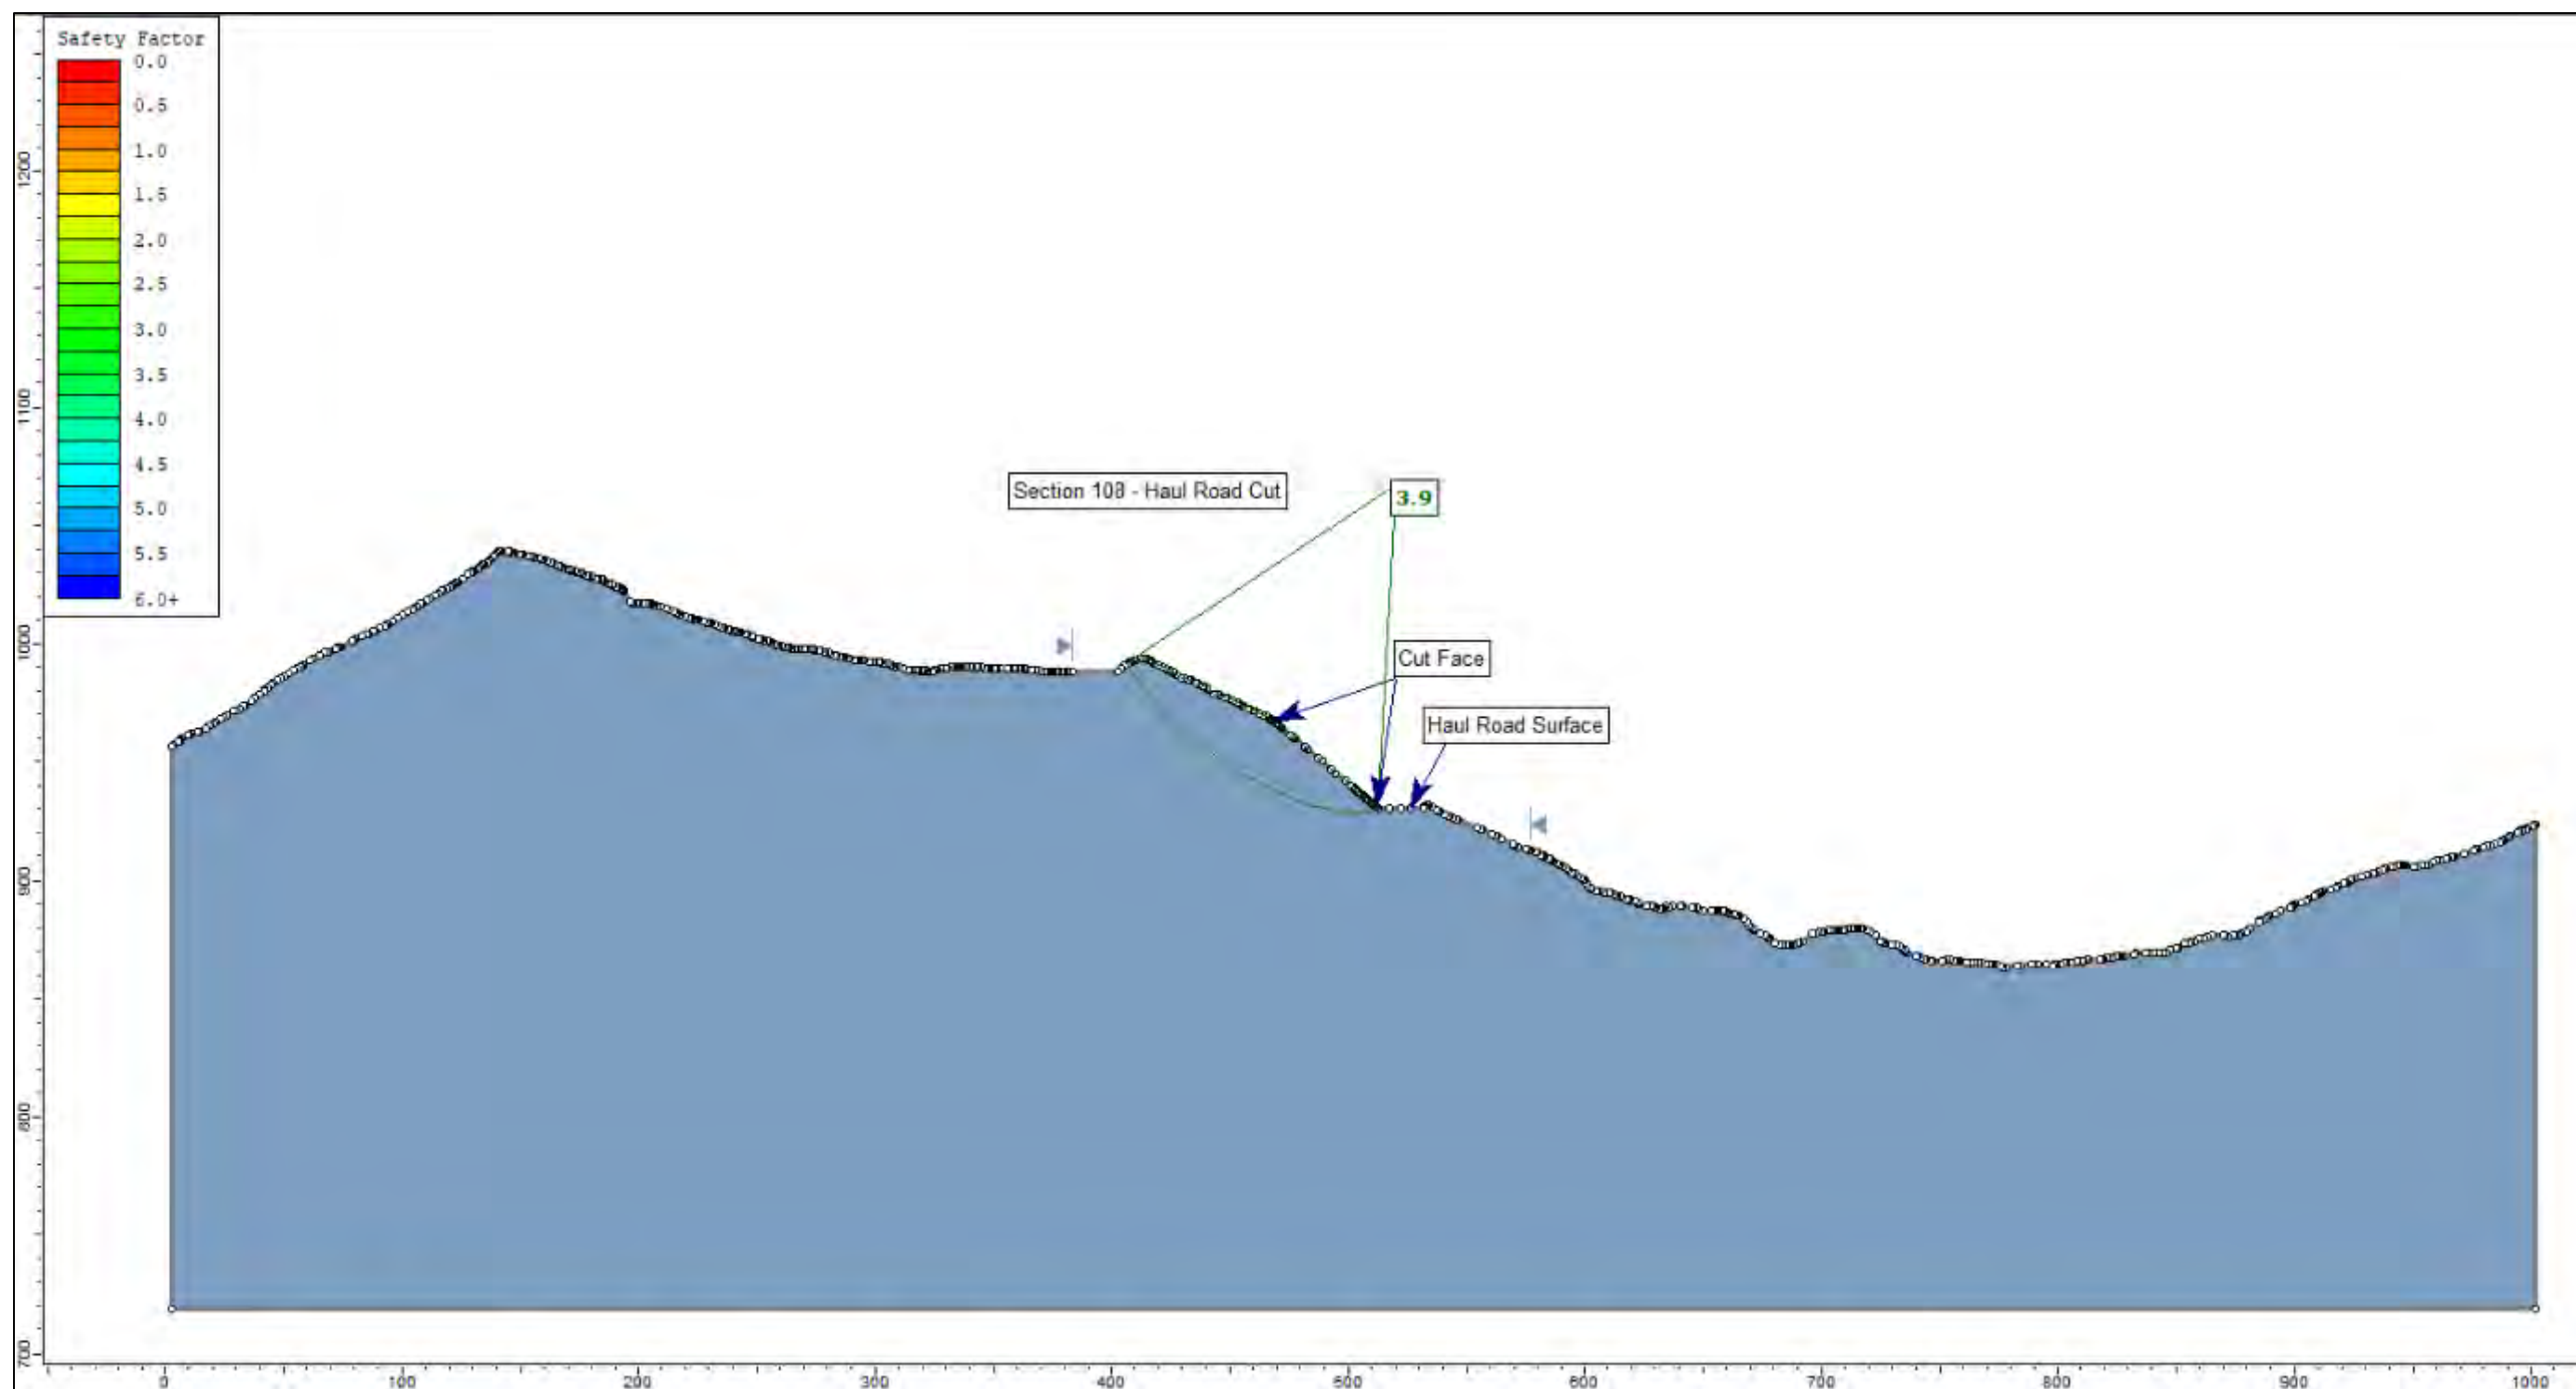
Haul Road Cut - Section 108 – Static Conditions.
